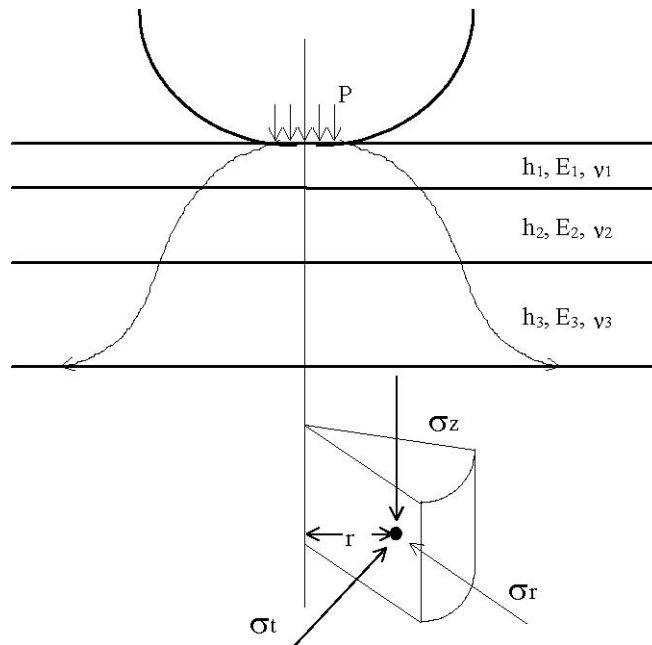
Three dimensional stress states in a typical pavement structure.
